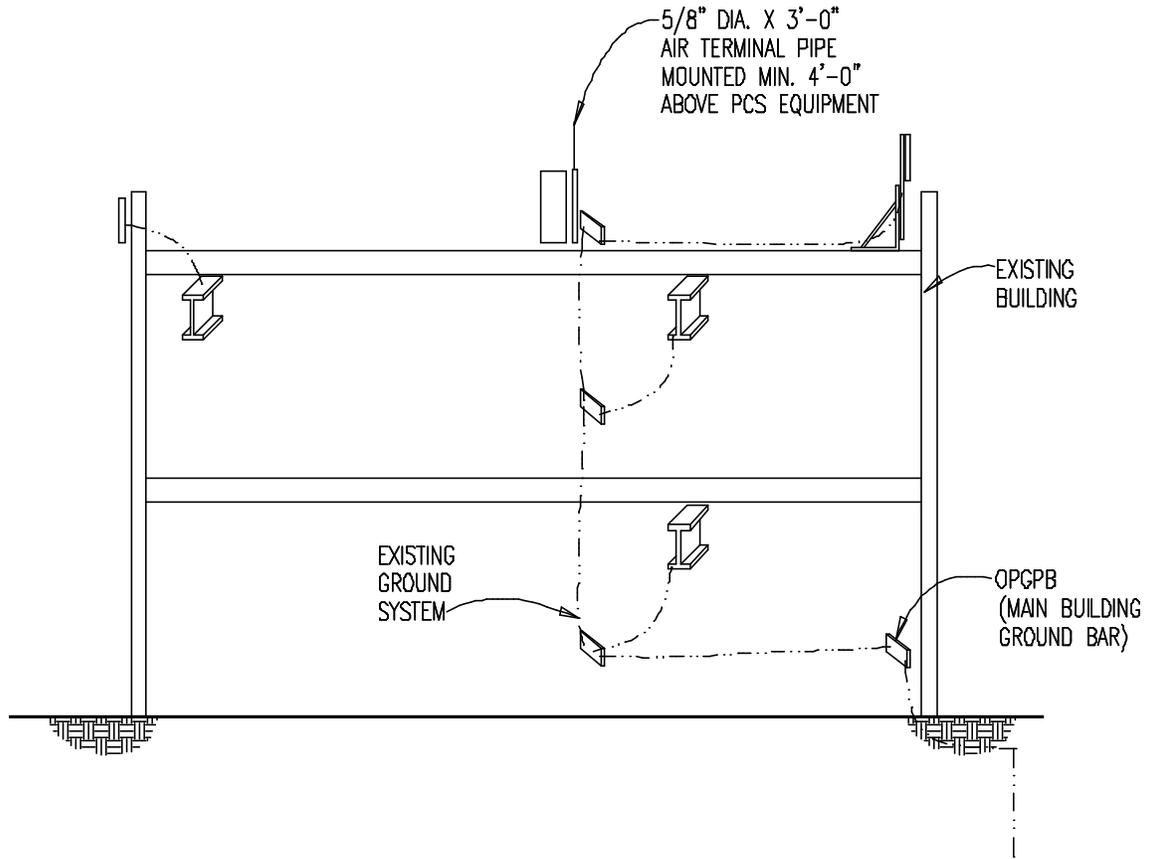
Typical Grounding of PCS Equipment Mounted on a Building Roof
